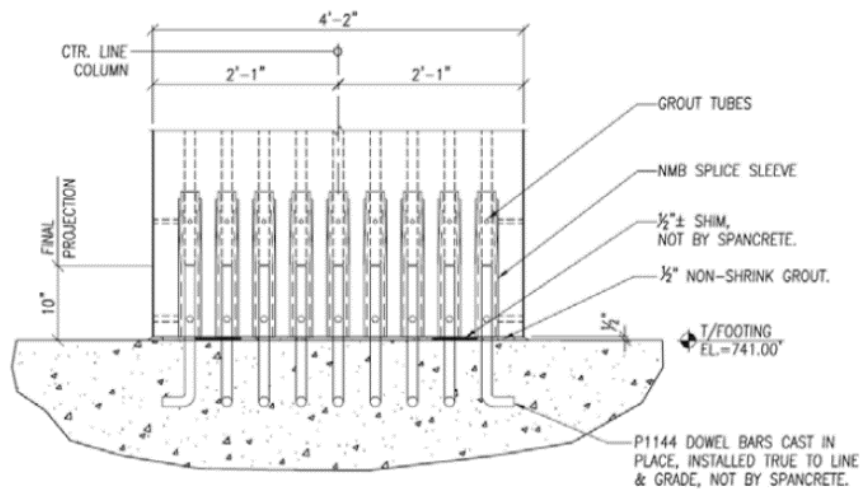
Column-to-footing connection detail Rawson Avenue (Olivia 2014)
